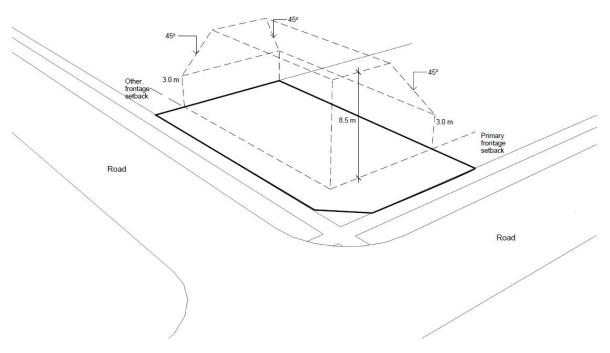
Building envelope for corner lots as required by clause 8.4.2 A3(a) and clause 8.5.1 A2(a)
